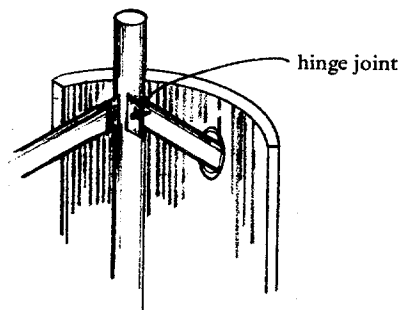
Conceptual drawing of modified drilled-and-grouted pile.
